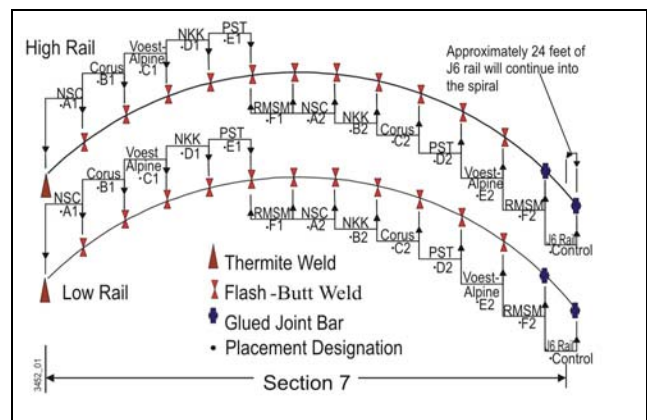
Rail Evaluation Test Layout, Section 7 at FAST
